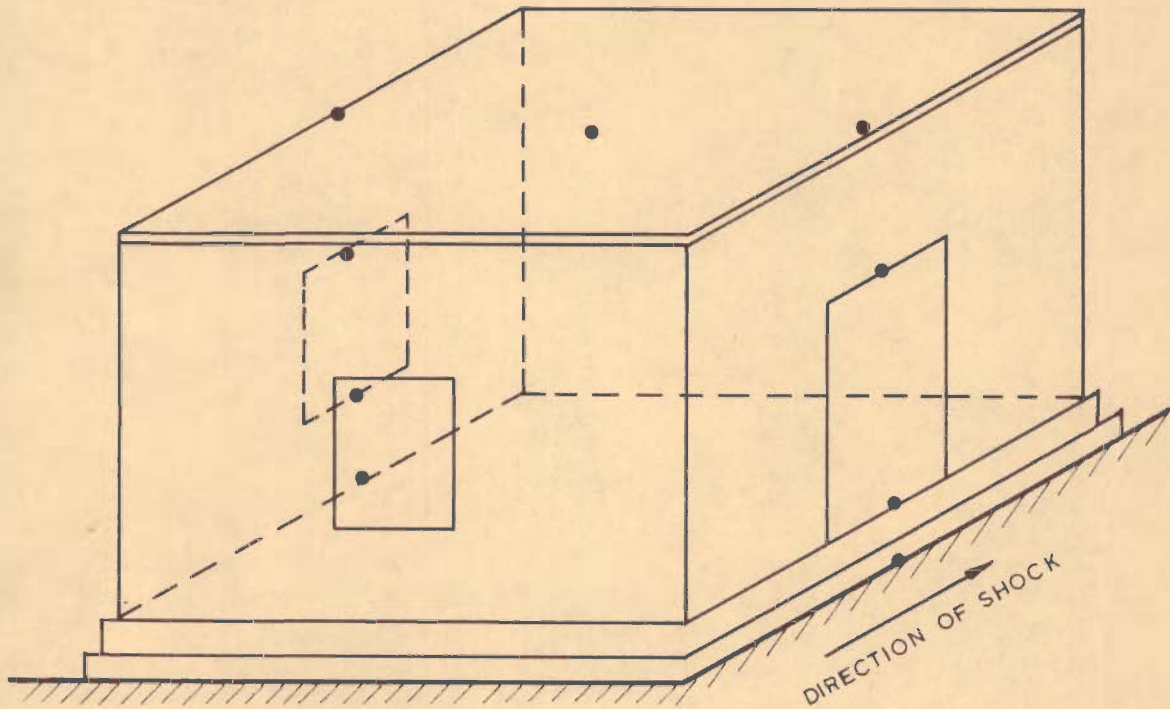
BRICK BUILDING MODEL IN CEMENT MORTAR WITH LINTEL BAND
